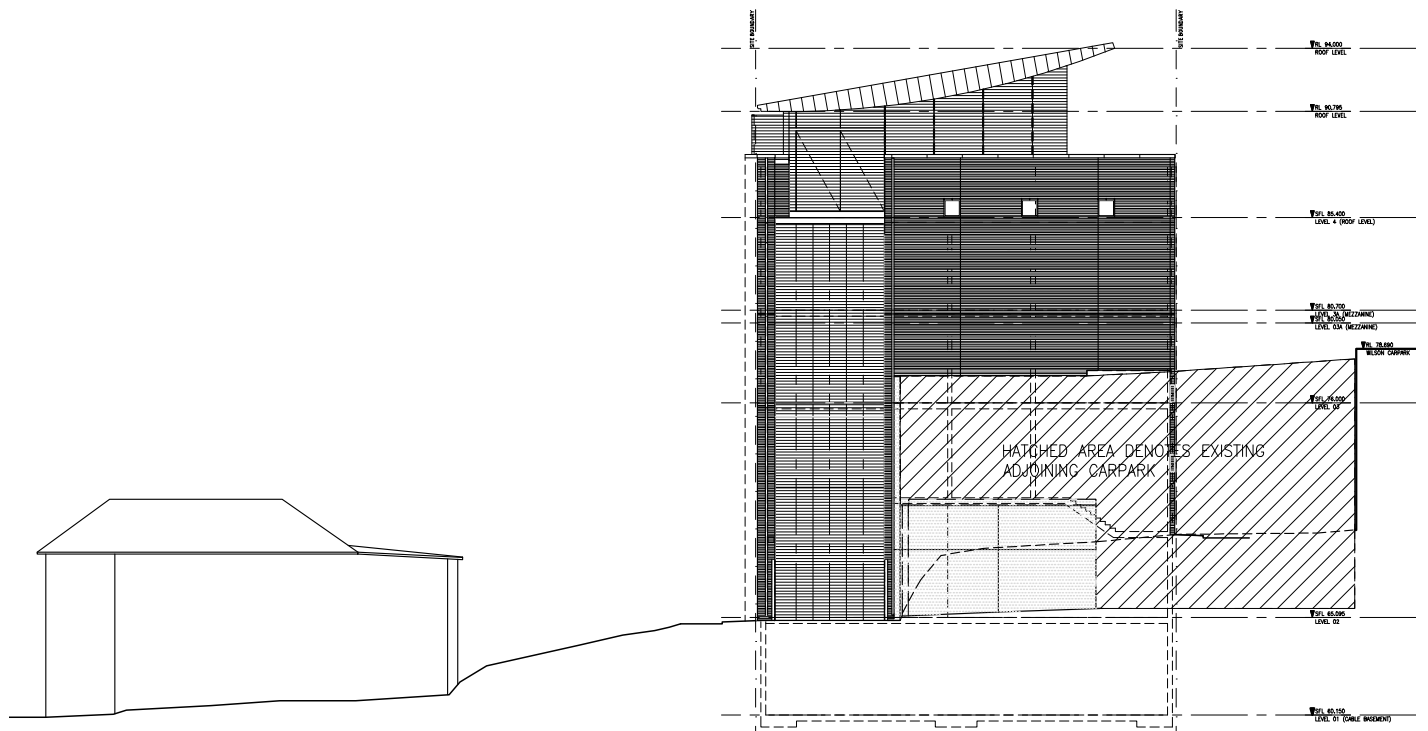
Elevation showing the relationship between number 136 Walker Street and the proposed substation (Source: Kann Finch Group, drawing number SD 58)
